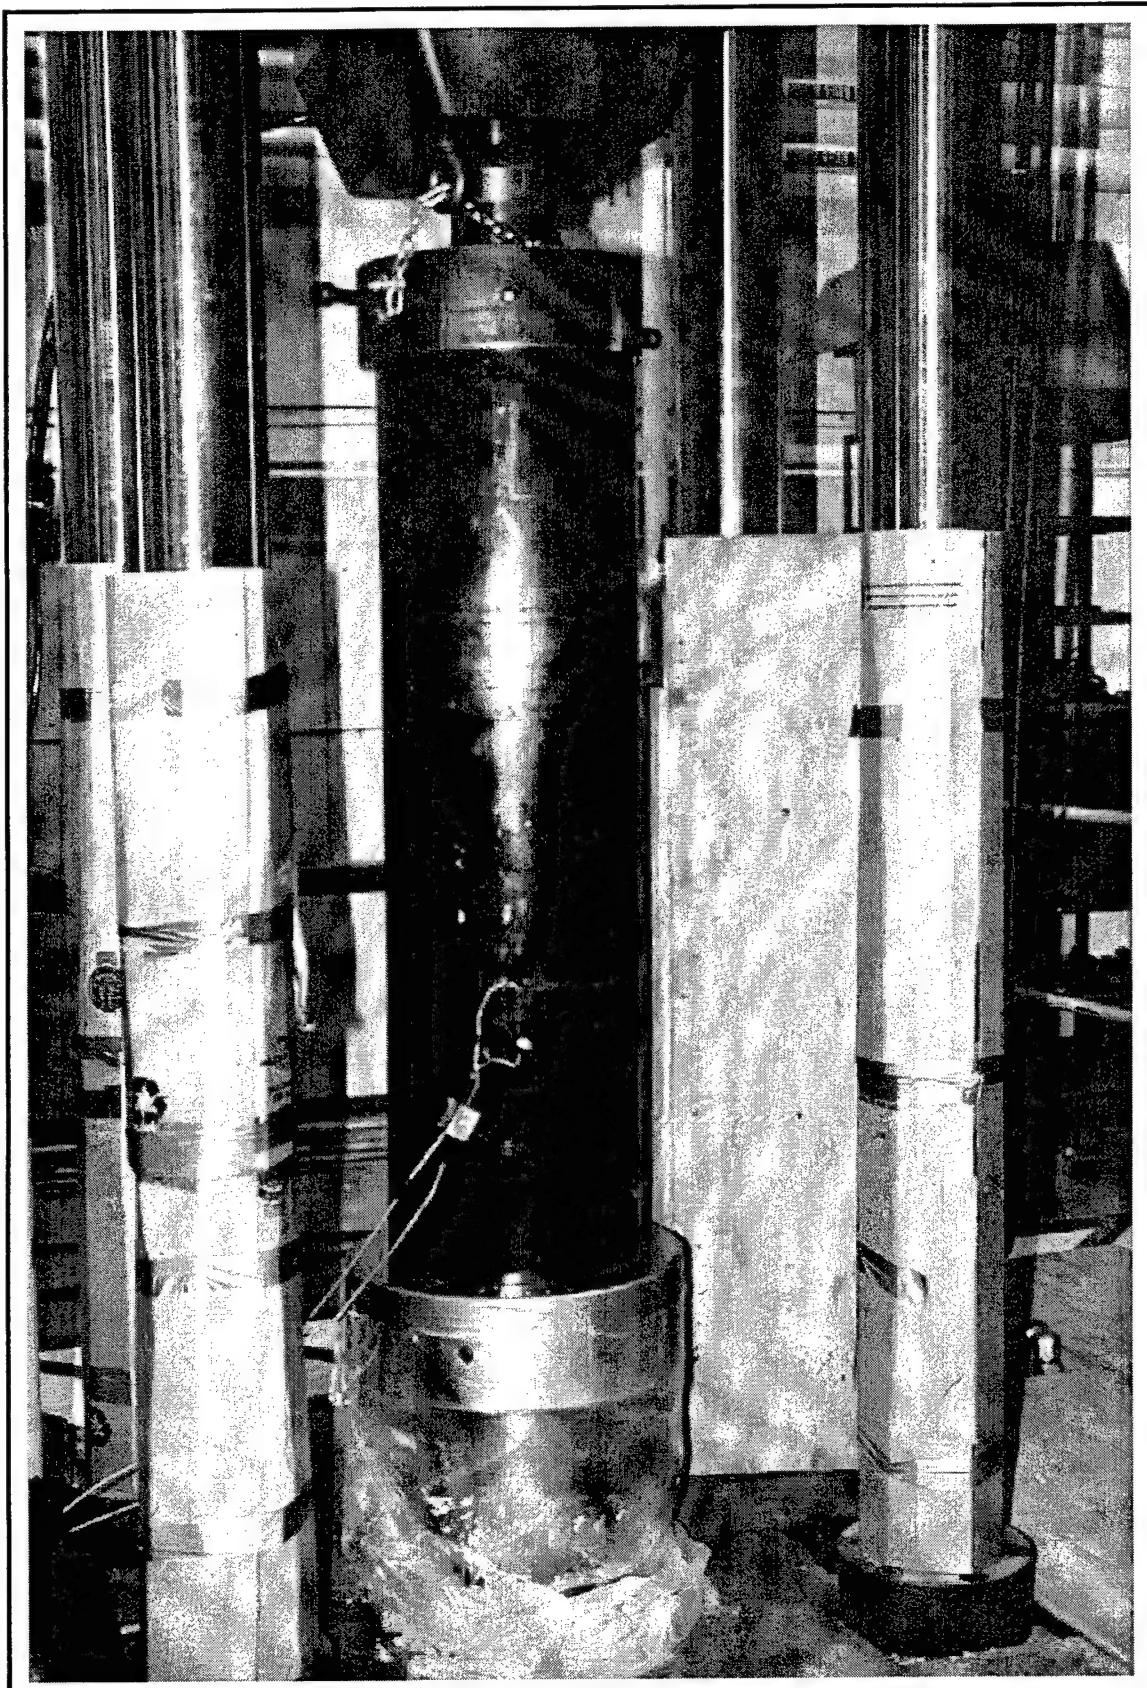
Typical setup for the compression testing of the loadbearing piles.
